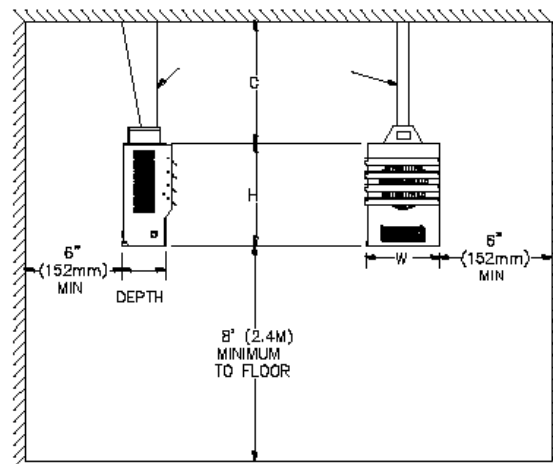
Horizontal Ceiling Mount with Mounting Arm
